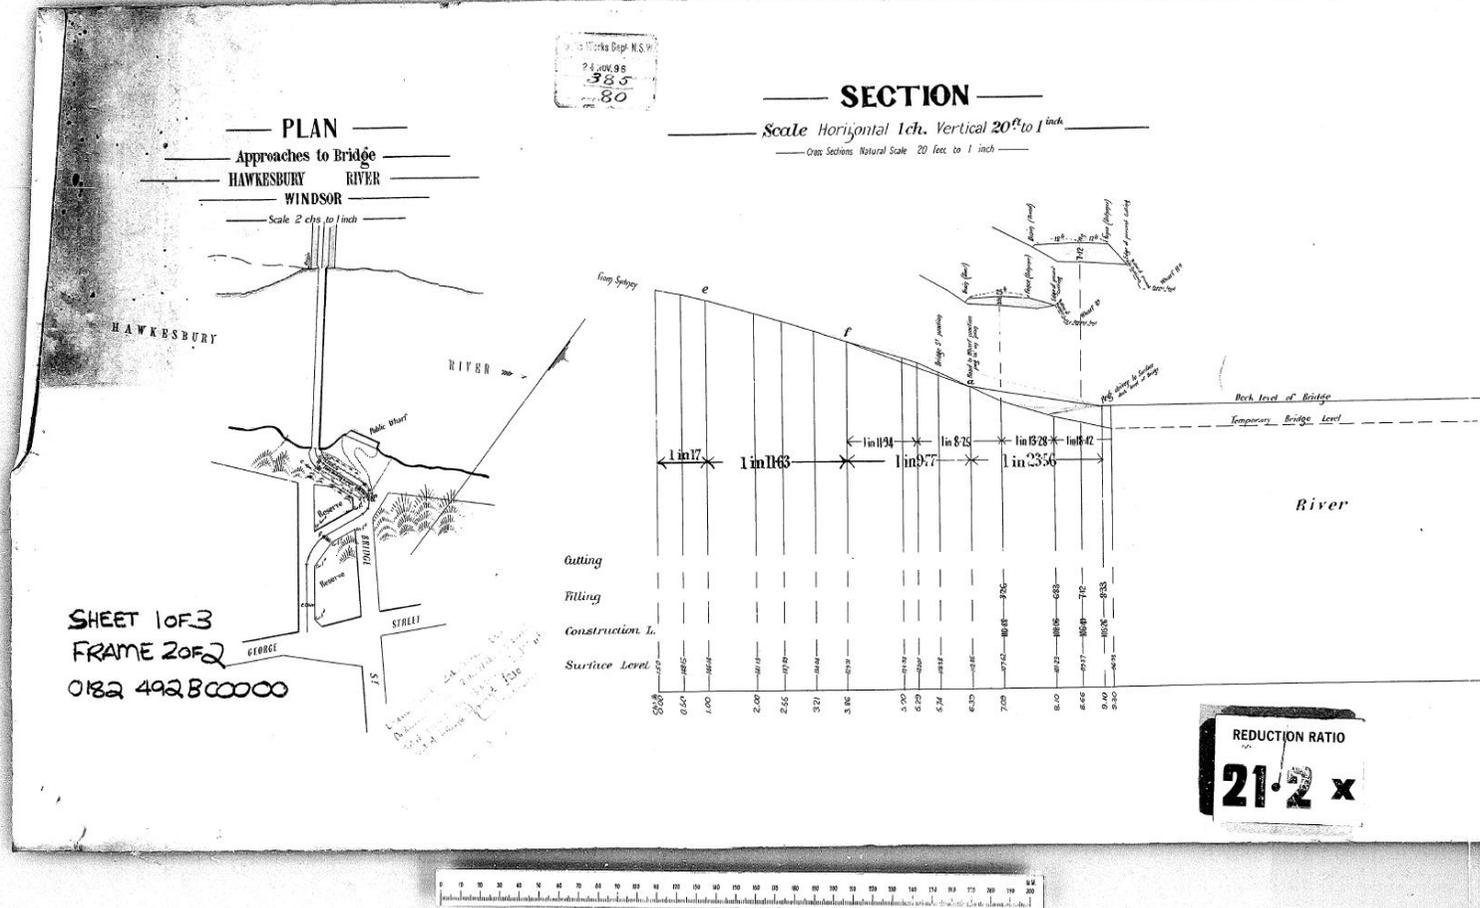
Plan and longitudinal section of the proposed modifications to the bridge showing the level of the temporary bridge in relation to the proposed new level.⁴⁴⁸ Review of the small sections above indicates a steep drop from the road to the old bridge decking, which was to be rectified by the proposed works. Of interest are the words “Drain (paved)” in two locations, the level of “Wharf Road” in relation to the level of road behind the fence. Refer to Plate 66 for detail.
